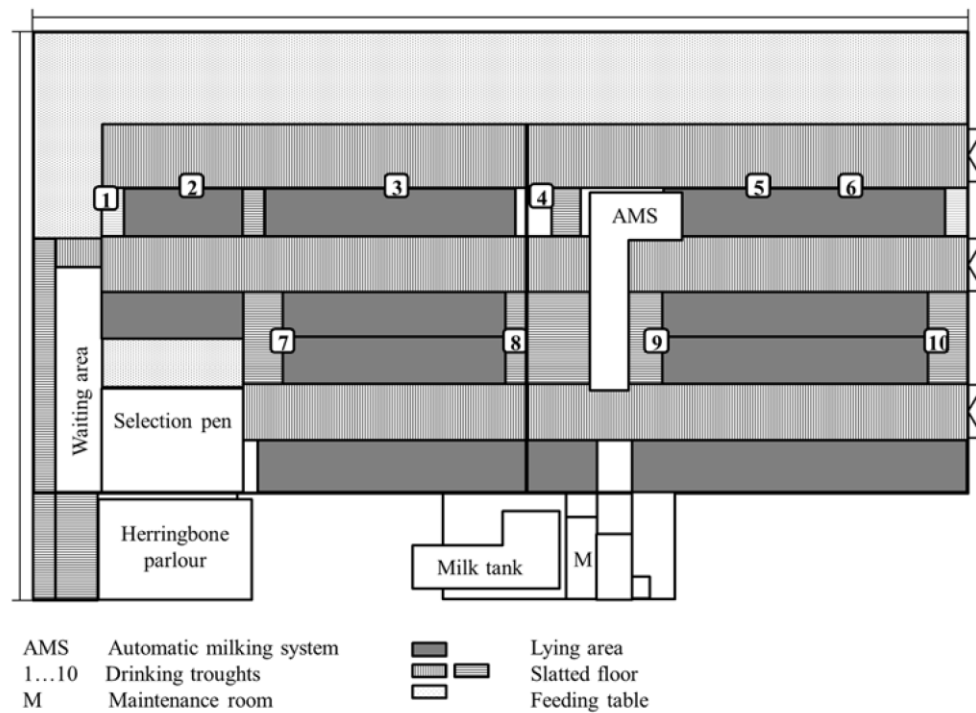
Plan of the dairy barn with milking systems and drinking troughs.
